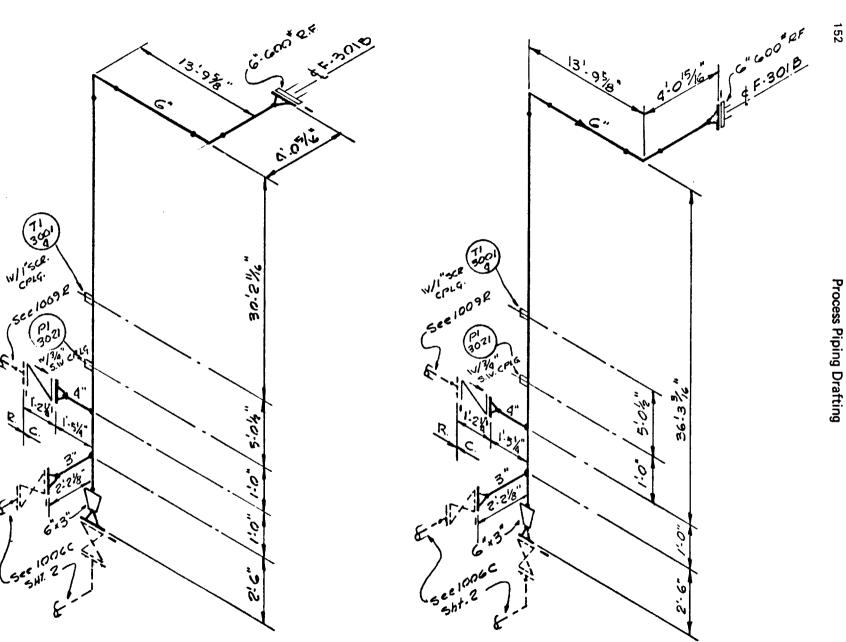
Dimension Methods (courtesy of Fluor Corp.).
